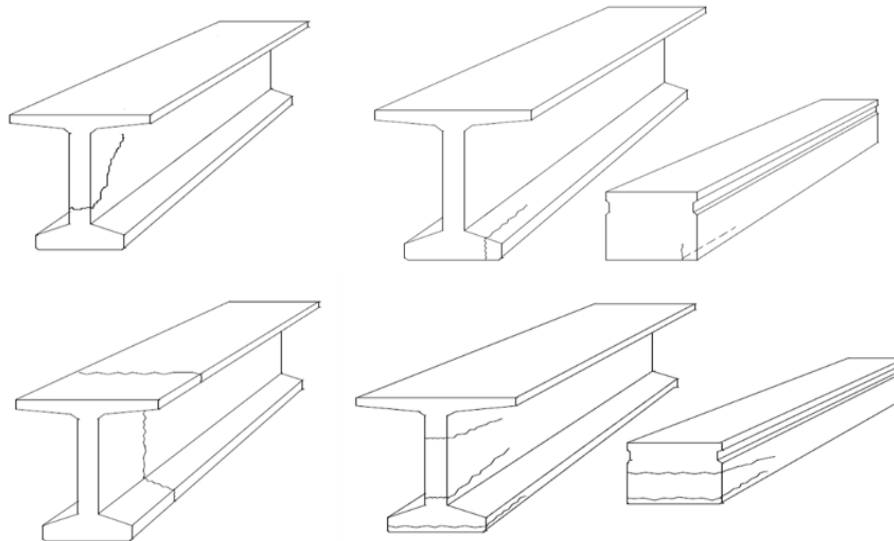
End zone damage configurations described by the PCI (a) Diagonal crack - dia (b) Flange bottom - bot (c) Vertical crack - ver (d) Longitudinal crack - longi
